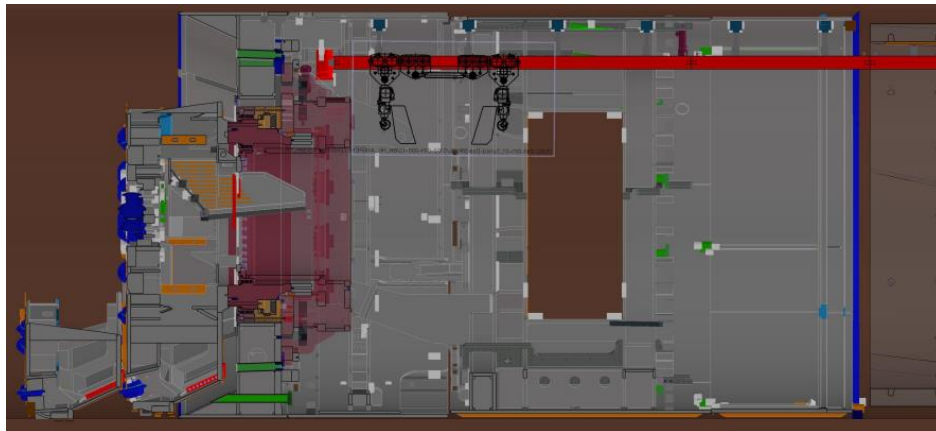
Gripper shoes and advance cylinders disassembly ("HK 5102-091-001-01 Shield Disassembly", Herrenknecht, 2022)
